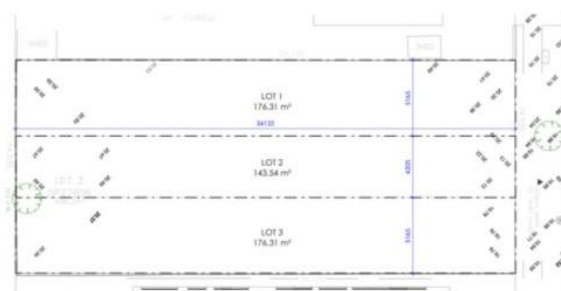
Subdivision plan showing proposed lot widths for each on the 3 proposed Torrens Lots
